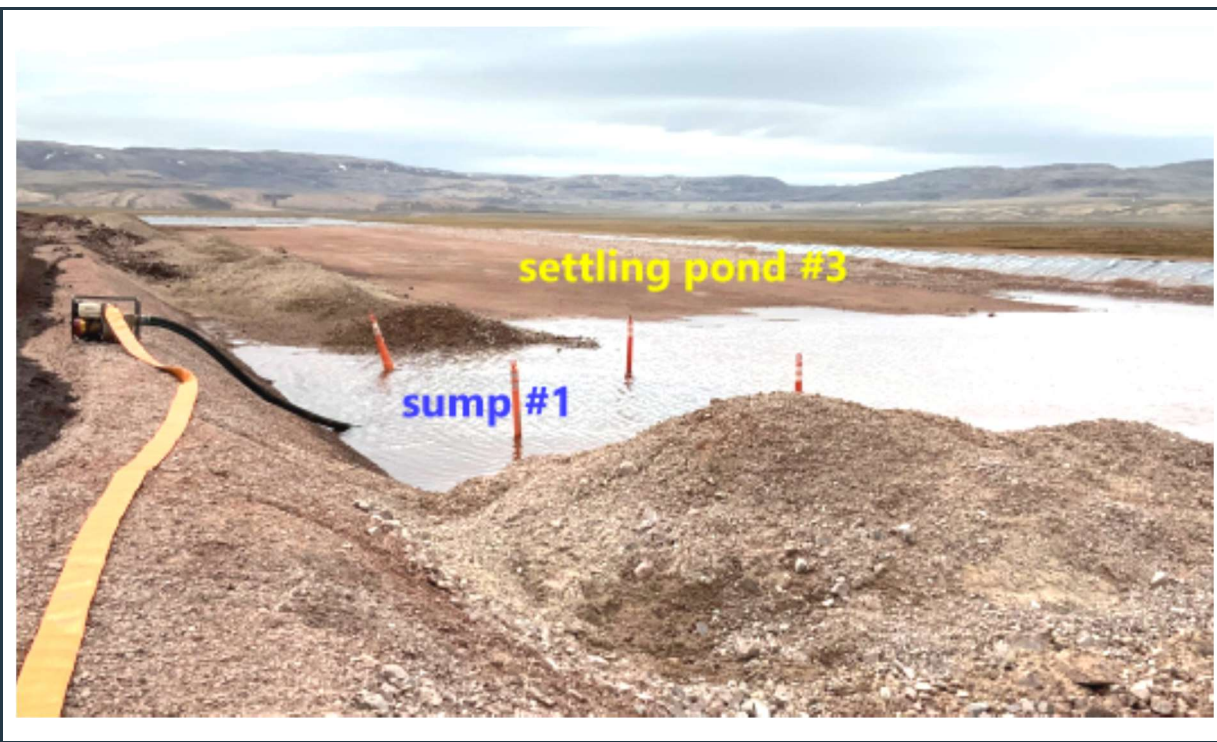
View of sump #1 in settling pond #3 along the west side of the ore stockpile.
